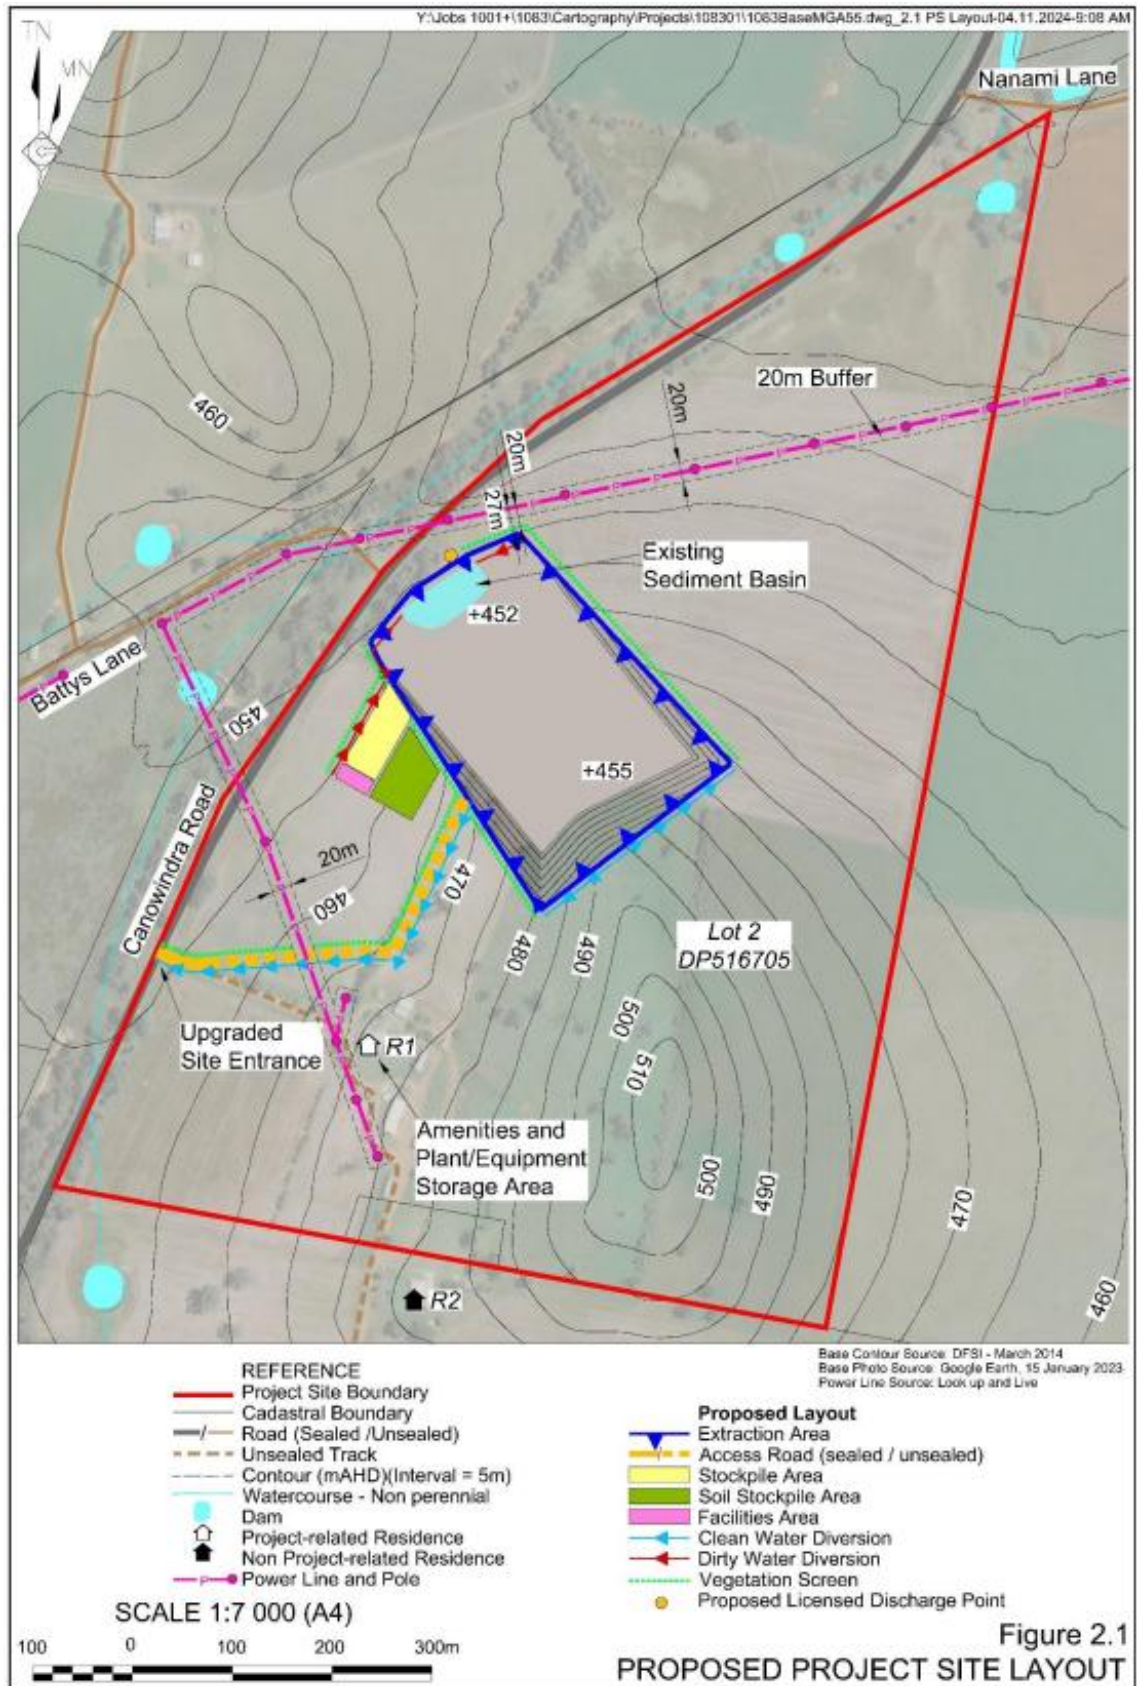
Amended Site Plan (extract from applicant's amended additional information letter dated 24 October 2024)
